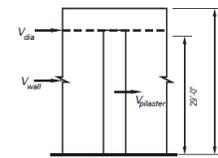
Wall In-Plane Earthquake Loads
